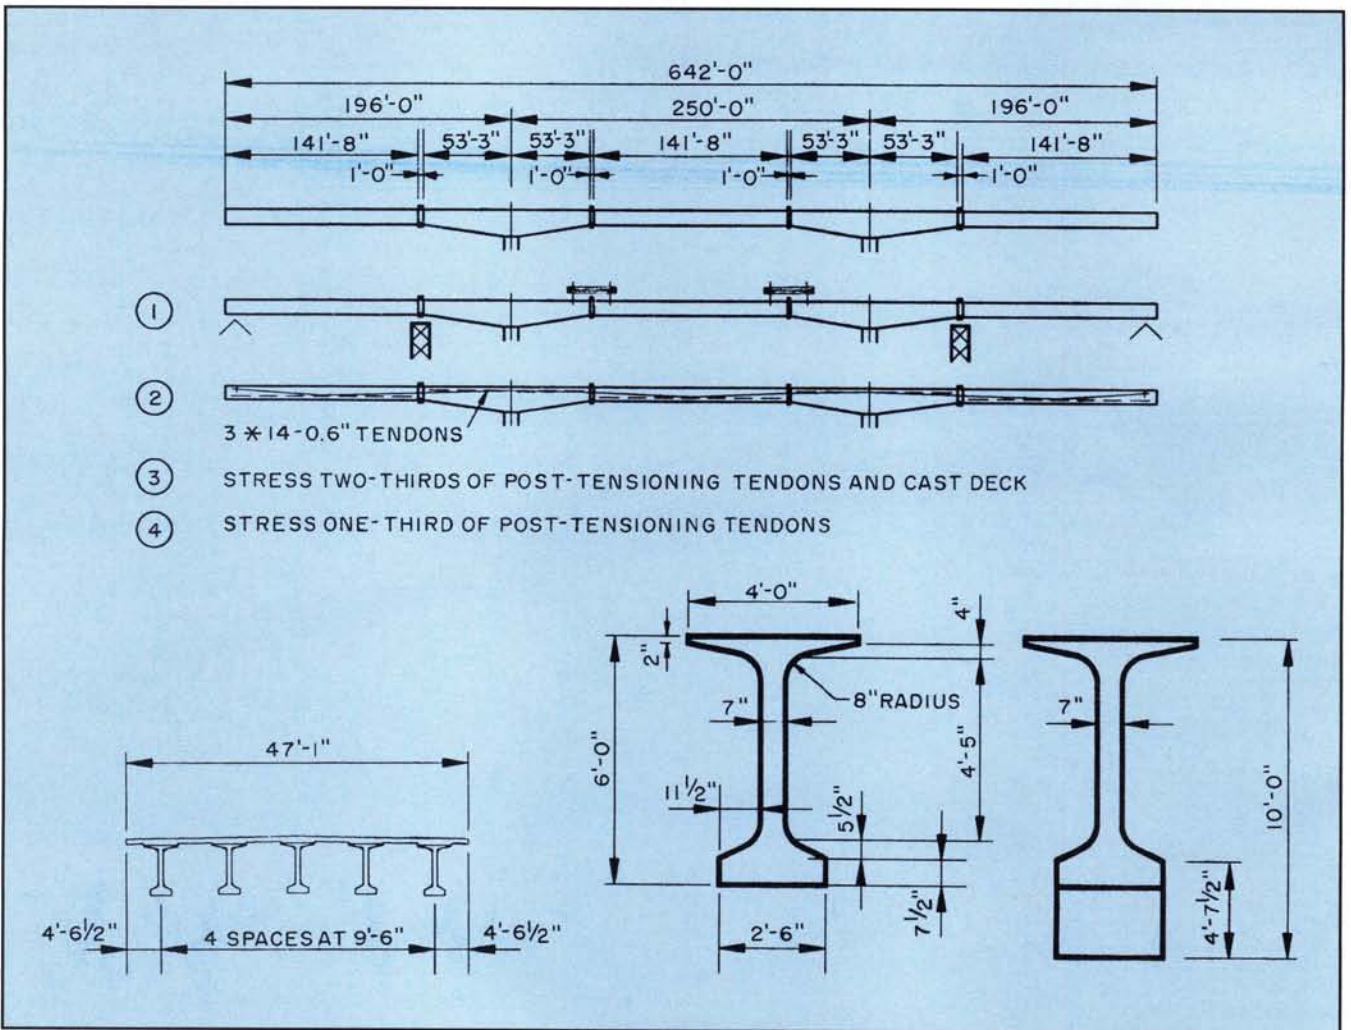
Elevation of three-span section, erection steps, deck section and cross-sectional dimensions of bulb-tee girders.
